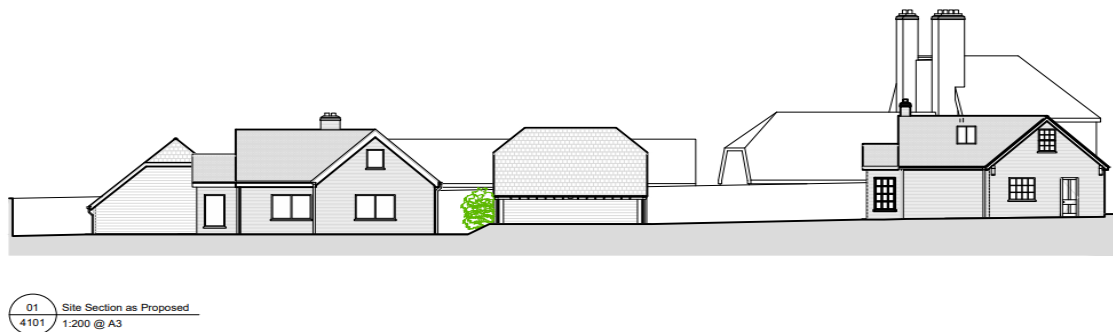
Proposed Section looking west – outline of Street Farm House and Pickle Cottage shown in background
